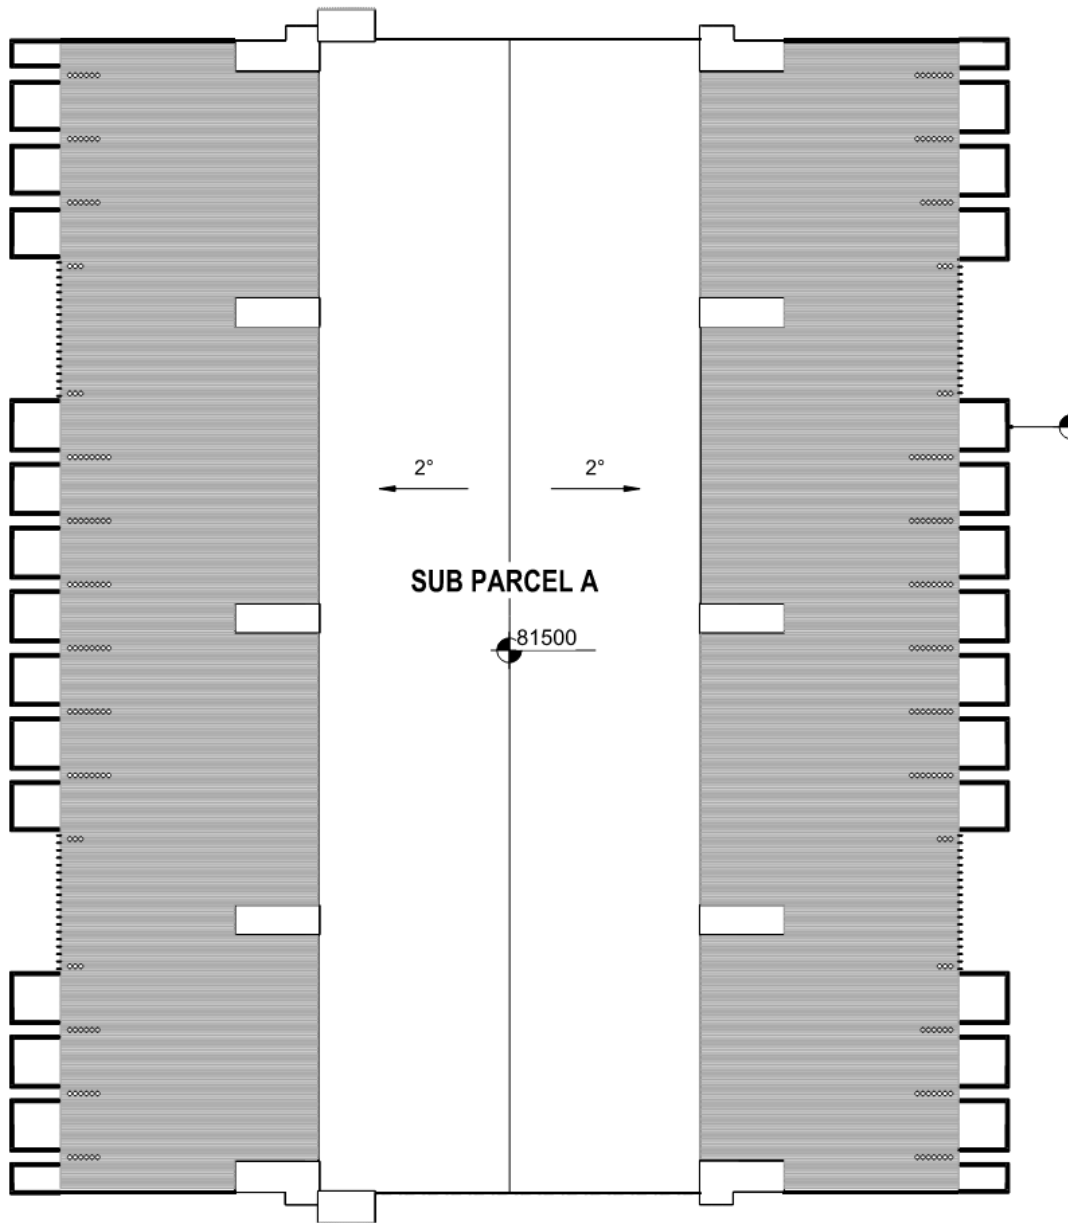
Level 4 Layout of Data Hall Building – Typical per Sub Parcel
